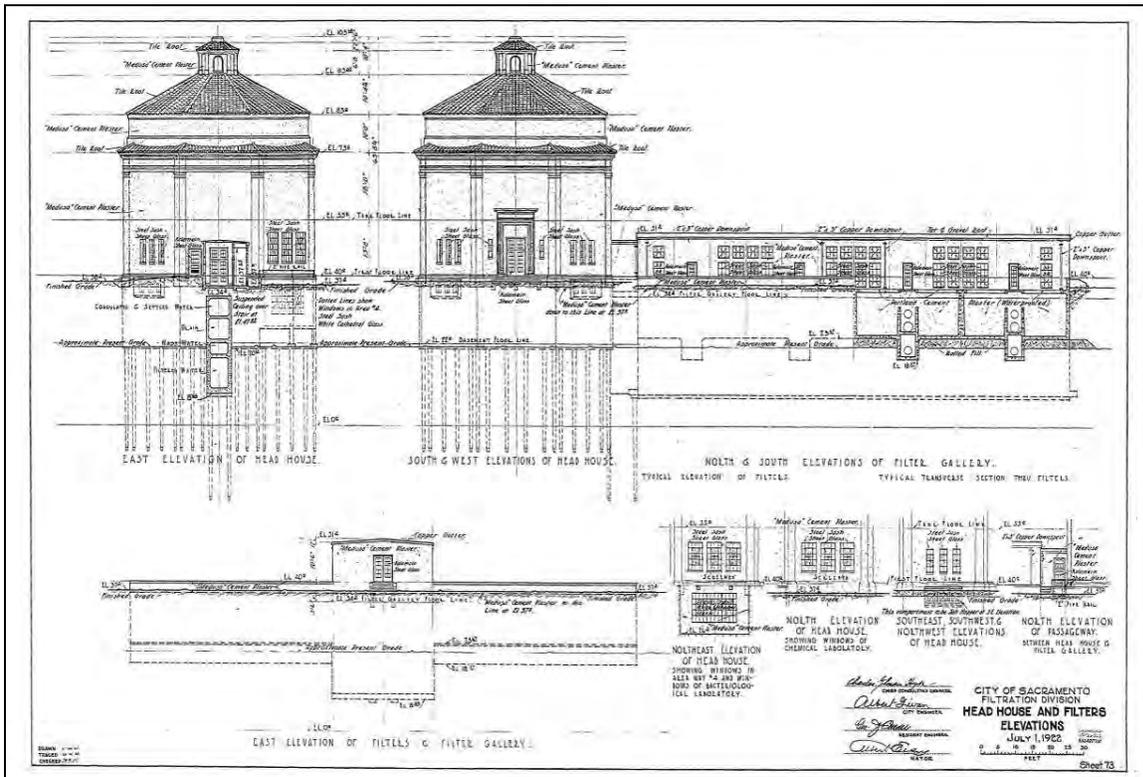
Elevation drawing for Head House and original part of West Filter Building dated 1922.
